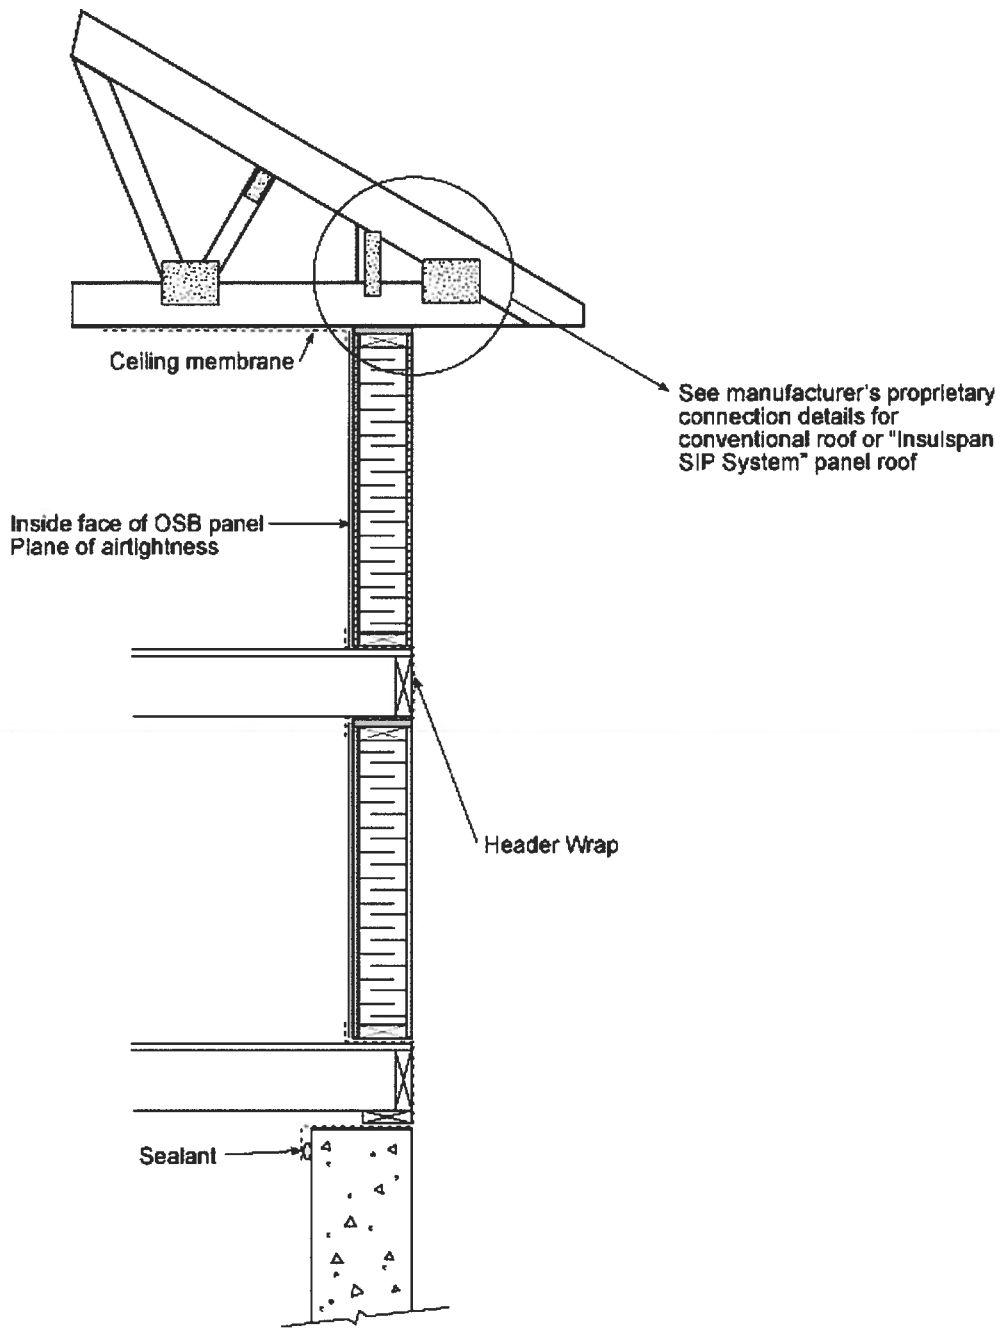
“Insulspan SIP System” – proprietary air barrier system – continuity of seal of the inside barrier face must be maintained
